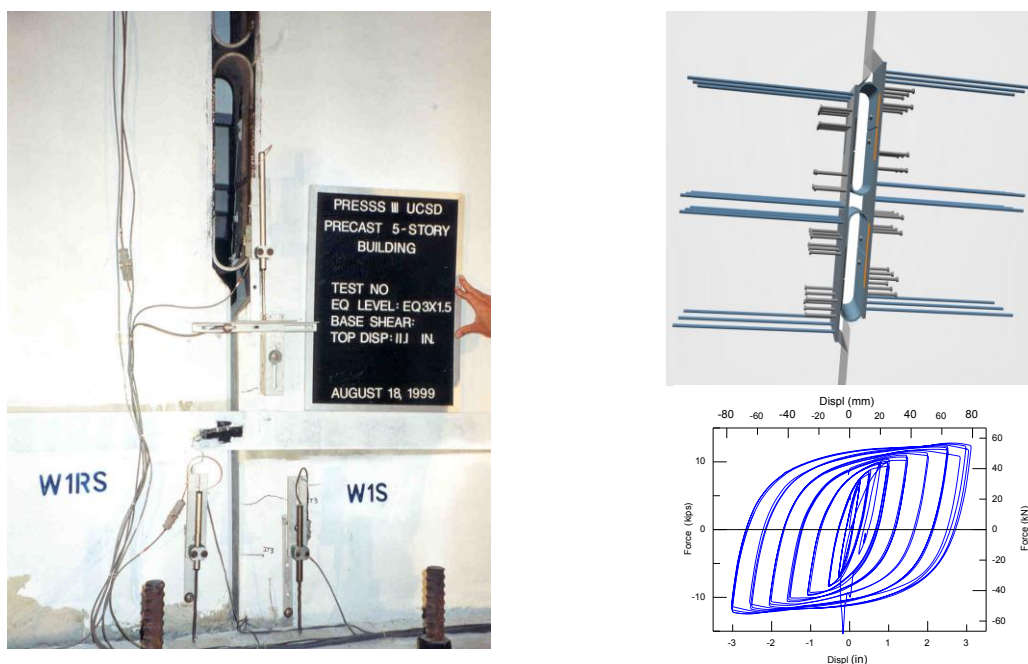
Rolling displacement behaviour of U-shape Flexural Plate Dissipaters between rocking walls
